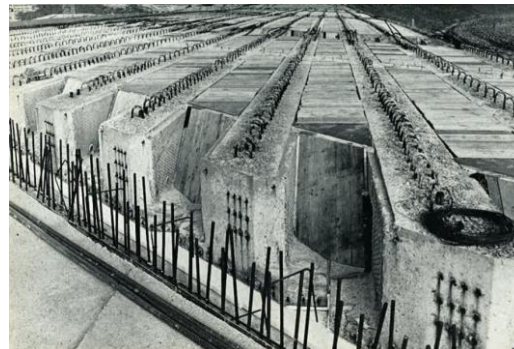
Concrete girders with formwork (Spanbeton, n.d.-a)
